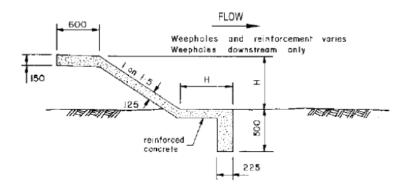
, Concrete slab protection (Department of Transport and Main Roads)
